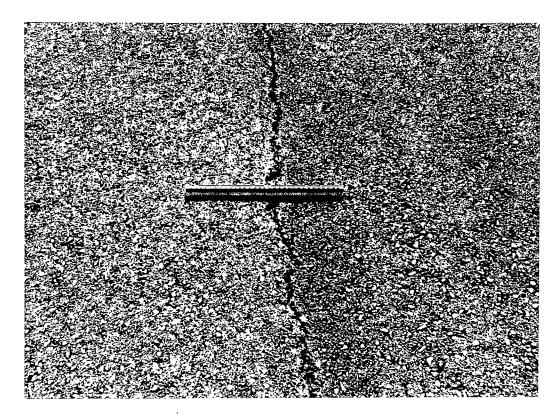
Typical longitudinal cracking, Runway 15-33 (R3C)
